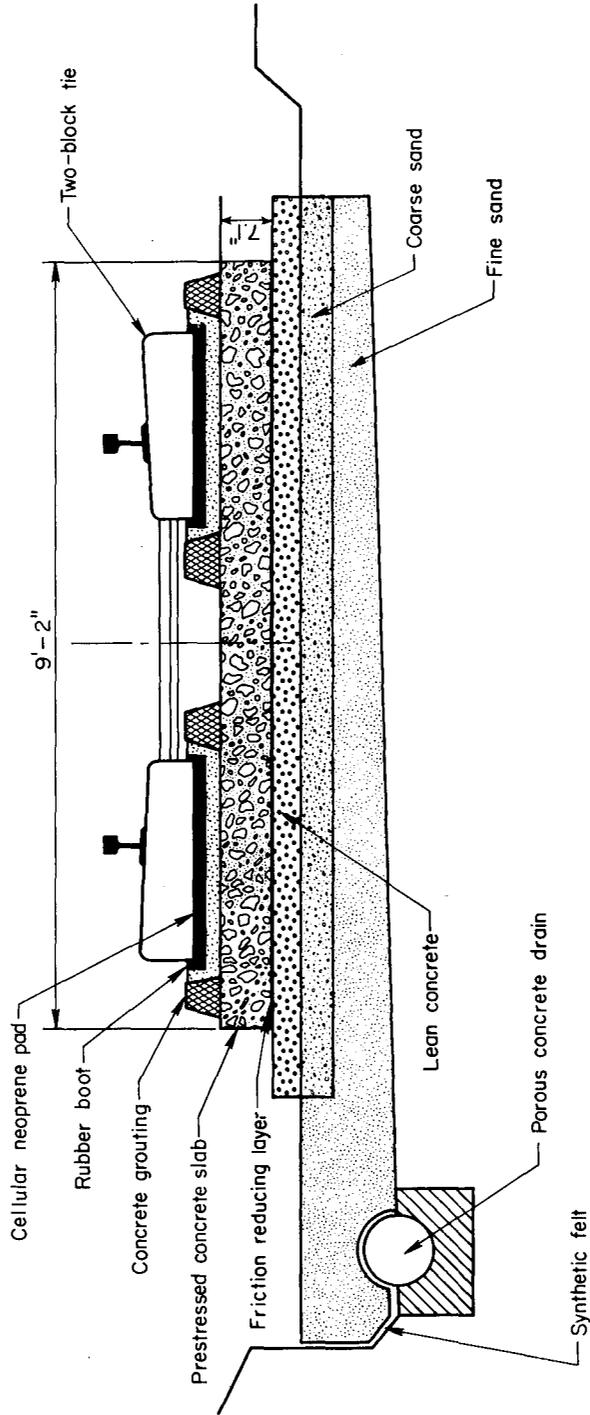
CROSS SECTION OF SLAB TRACK AT NEUILLY-SUR-MARNE
